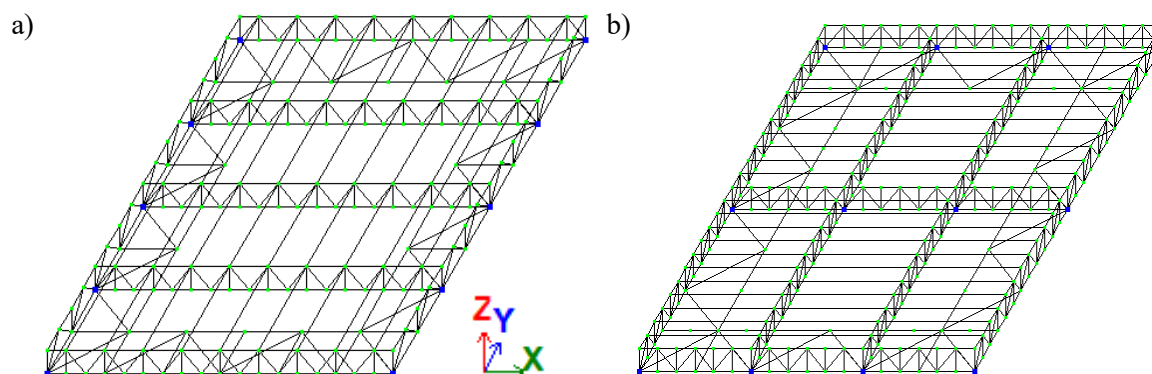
Finite element rod models of the roof system: (a) Model No. 1, consisting of rafter trusses with bracing made of hot-rolled angle sections; (b) Model No. 2, consisting of lightweight cross trusses forming rigid rectangular closed modules measuring 6×12 m
